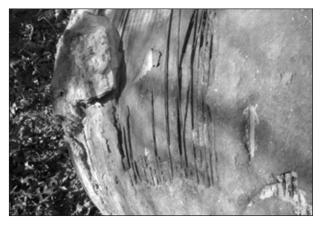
Example of a failure of a pre-stressed concrete cylinder pipe (PCCP). Source: WSSC.
